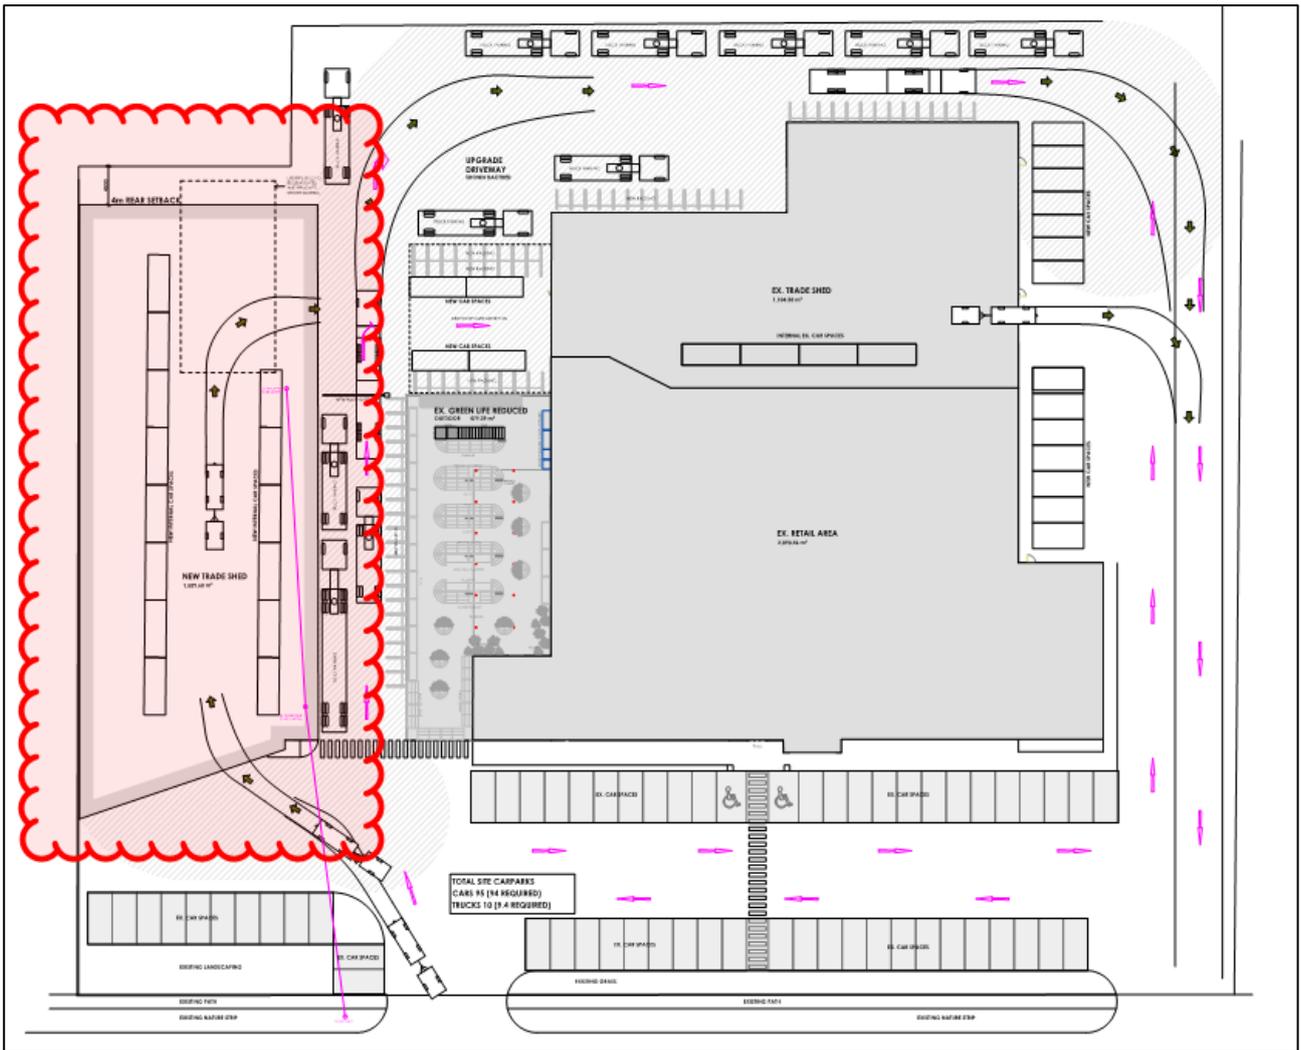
Site Plan with location of trade store outlined (Starbox Architecture, 2019)
